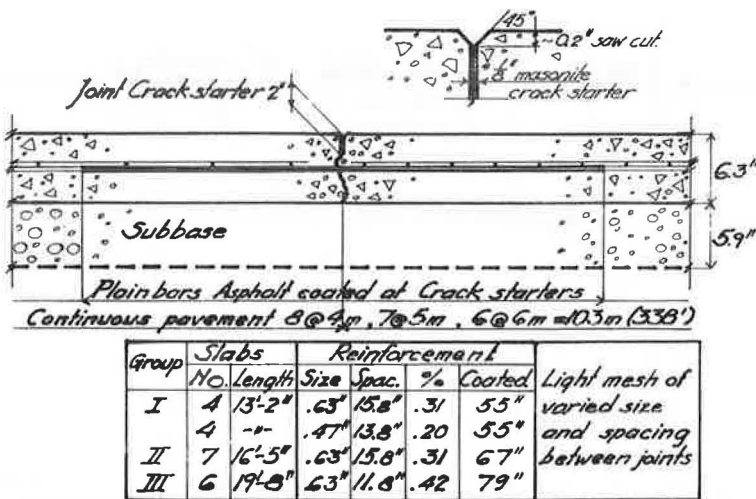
Design details of joints in the exploratory pavement with elastic joints and continuous reinforcement, built in 1964, with 0.20 to 0.42 percent steel and 13- to 20-ft joint spacing.
